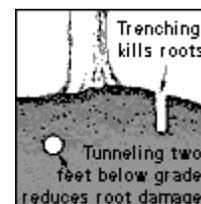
Protect roots from damage when laying utility lines by tunneling rather than trenching.
